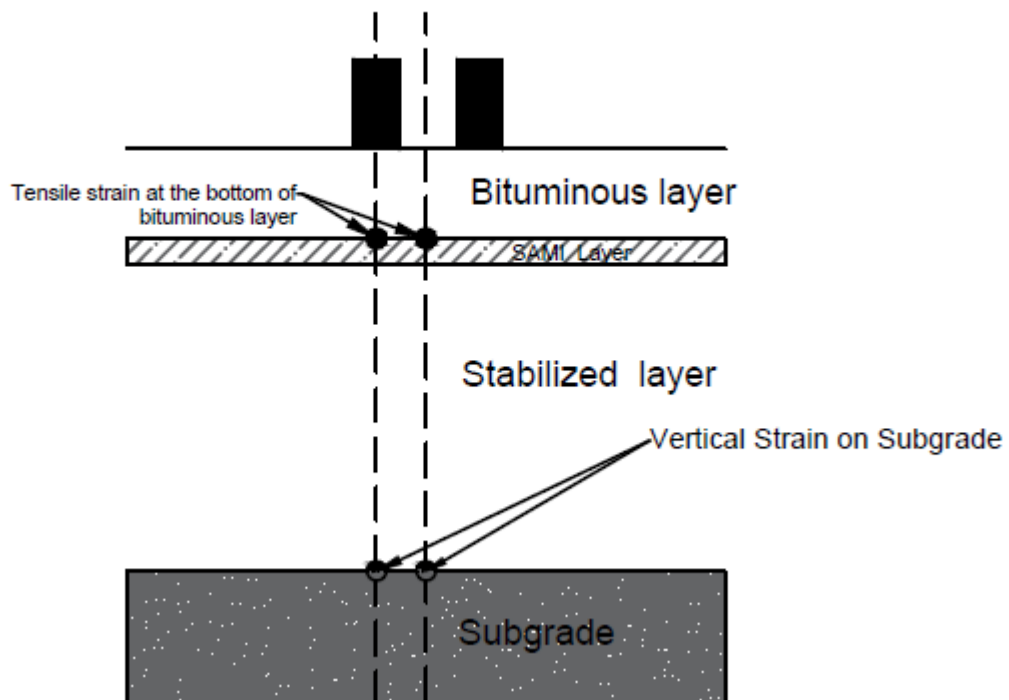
A Pavement section with bituminous layer, SAMI crack relief layer and stabilized RPM layer showing the locations of critical strains.
